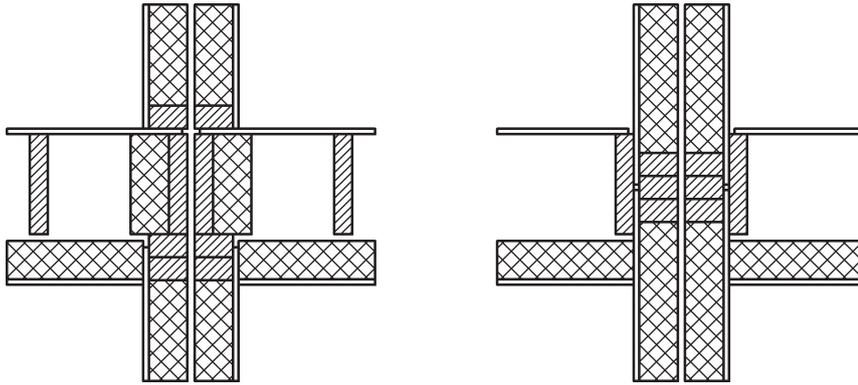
Examples of cross-junction between a floor and a double frame separating wall
